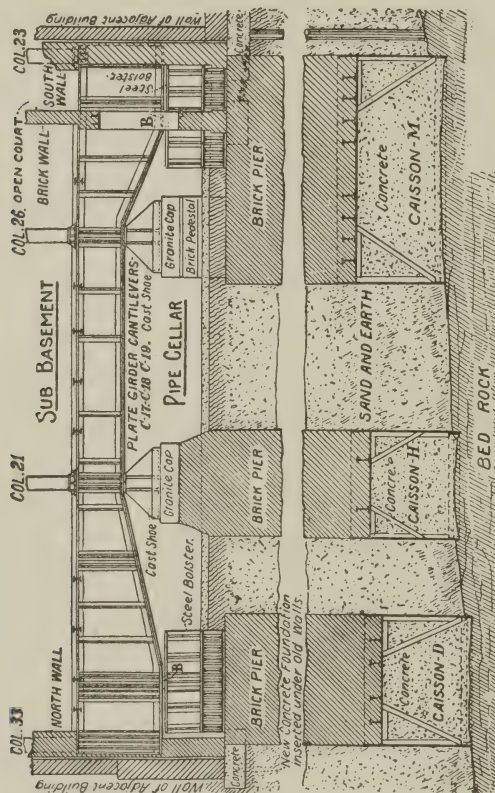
The Manhattan Life Insurance Building, New York City.—Transverse Section. \
